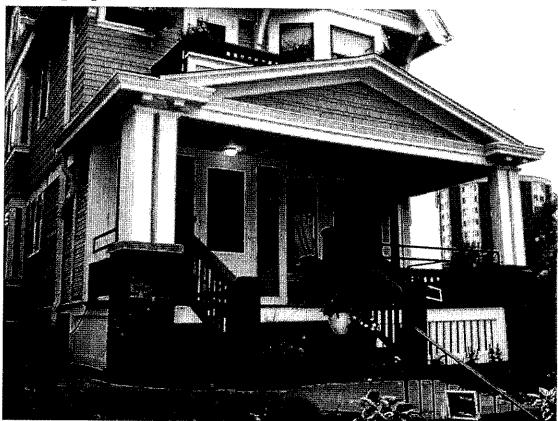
East elevation and part of south elevation from North 33rd Street. East elevation windows will be restored. Maroon aluminum exterior storm/screen units are not original and will either be reused or replaced in kind.
